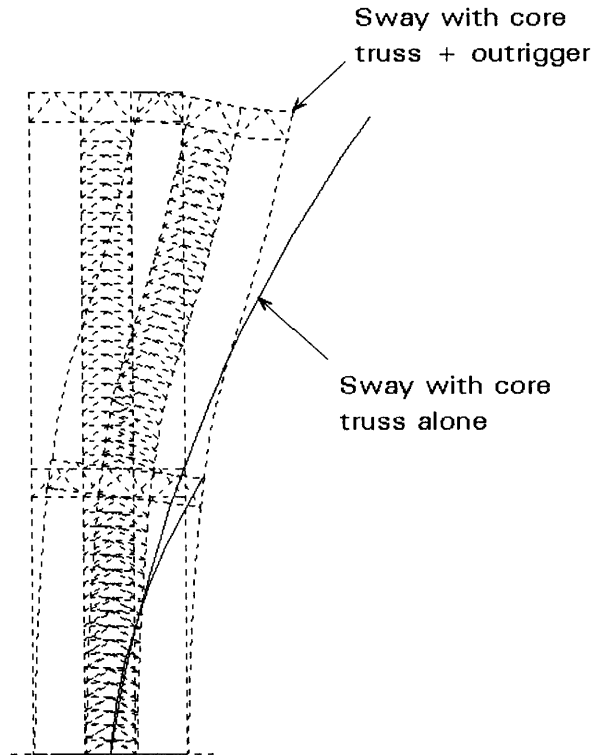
Improvement in overall stiffeners due to outrigger-bolt trusses
